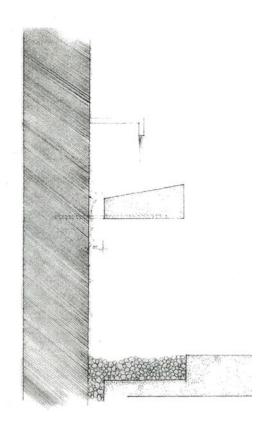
9 Hand basin. Red pigment to run down the concrete wall through water and stain over time.
